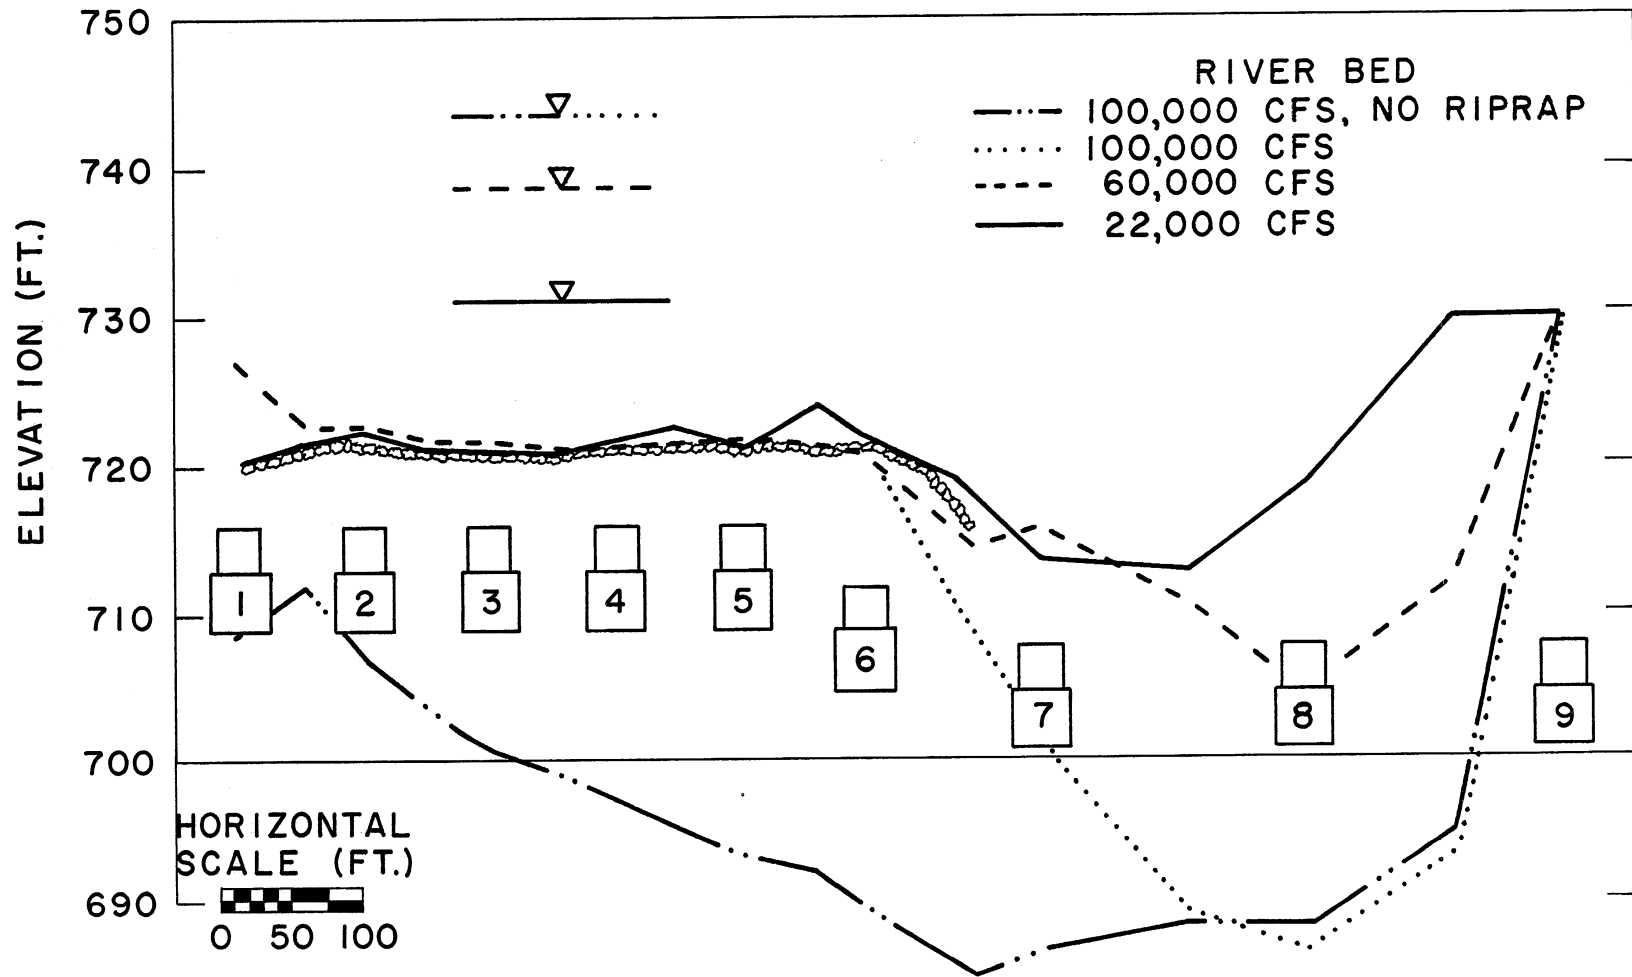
Bed profiles and water surface elevations at the bridge for the experiments of Series 6.
